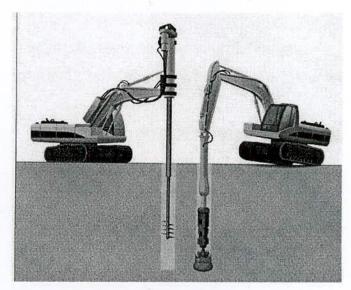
(a) Rammed Aggregate Pier installation process before structure's foundation (After Geopier 2005a)
